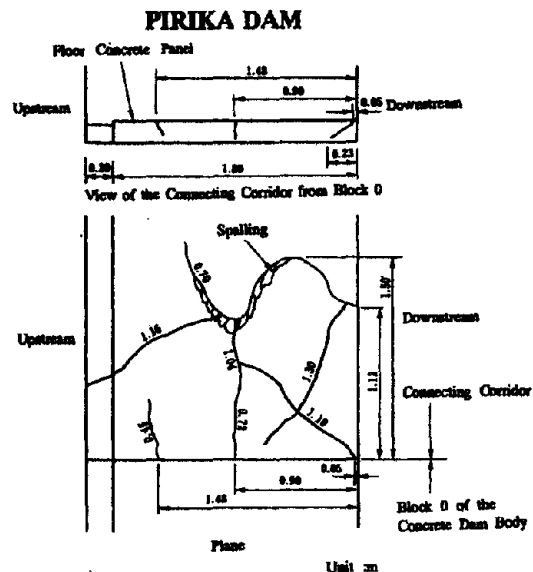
Spalled Cracks of the Floor Concrete in the Connecting Corridor (Parika Dam)
